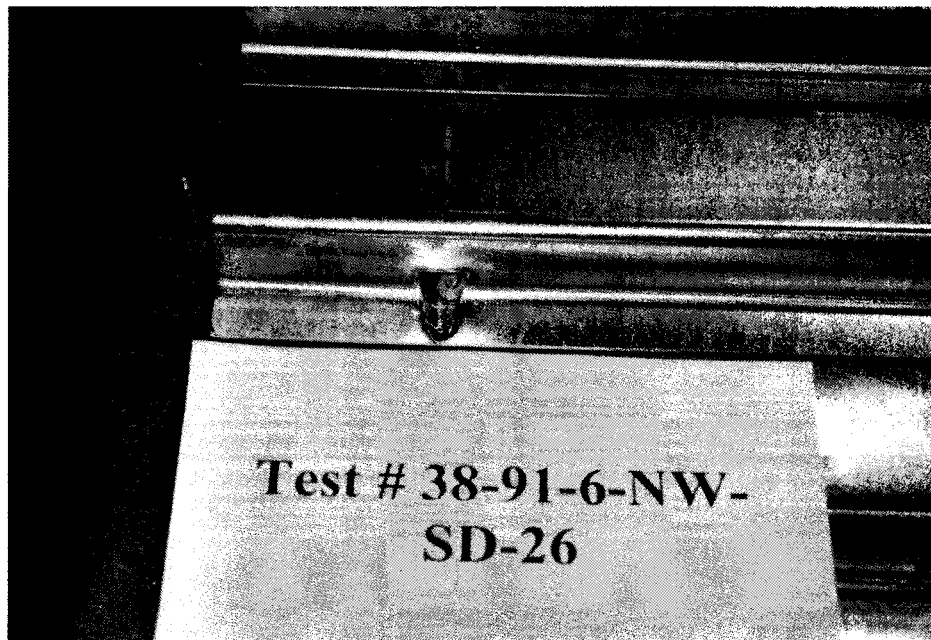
BFL failure mode at nailed connection C21, Test 26
